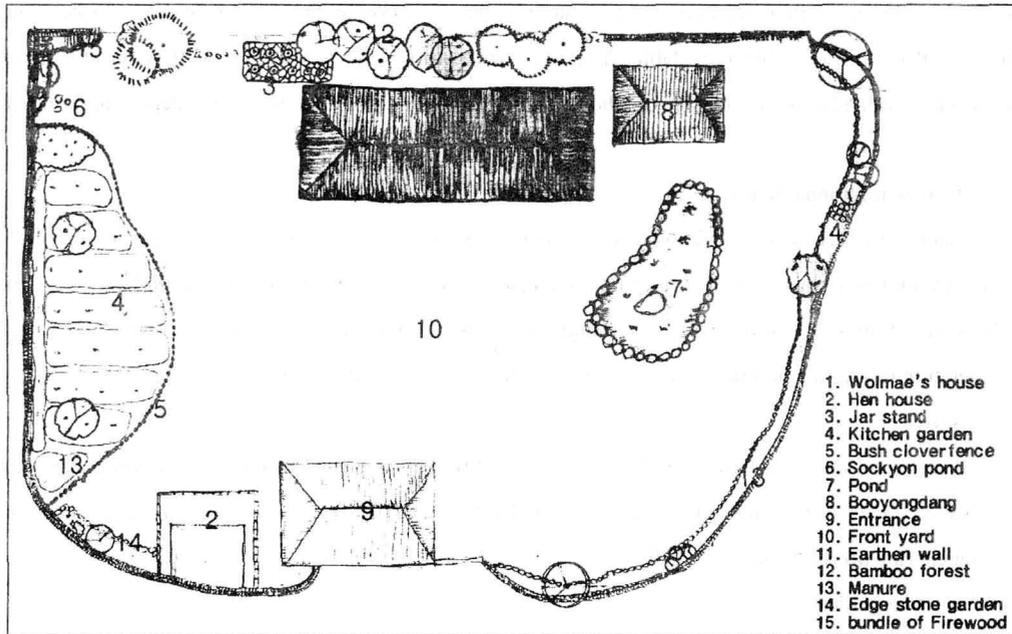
Layout of Wolmae's House (Namwon, north Cholla)
